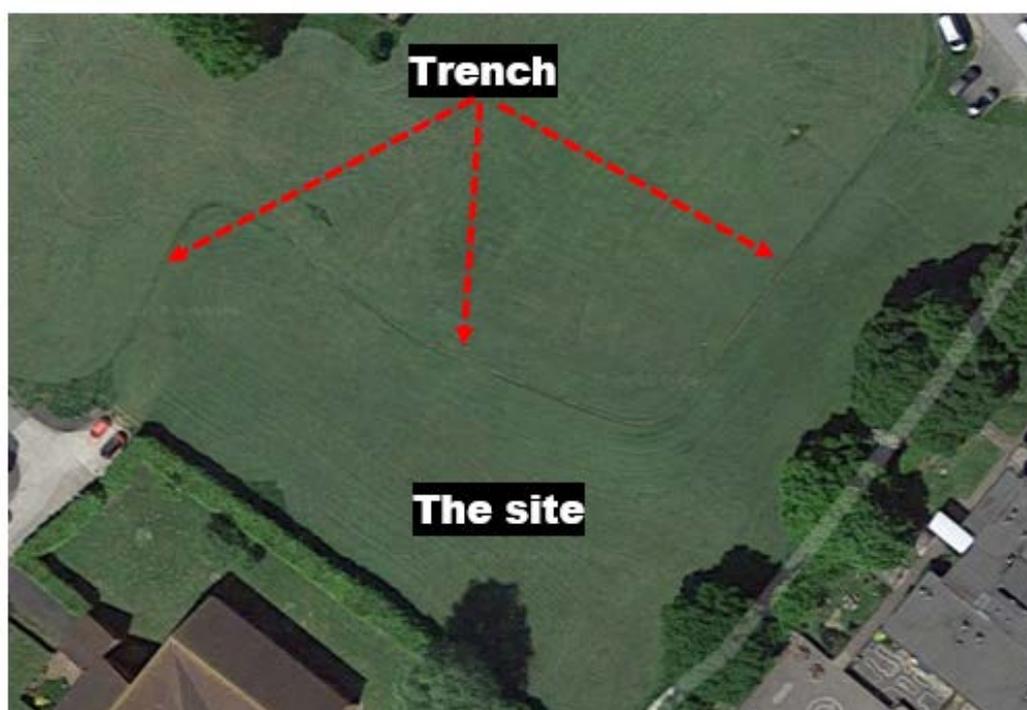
the existing gravel trench with venting ducts & location relative to the application site
